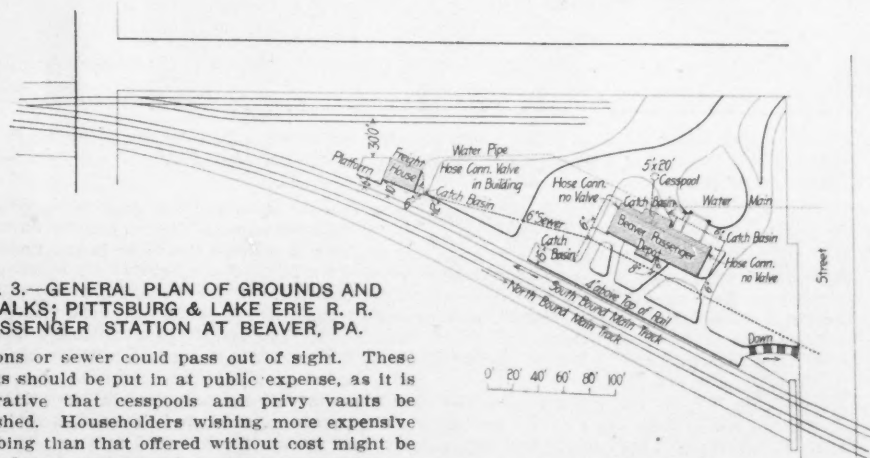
GENERAL PLAN OF GROUNDS AND WALKS; PITTSBURG & LAKE ERIE R. R. PASSENGER STATION AT BEAVER, PA.
